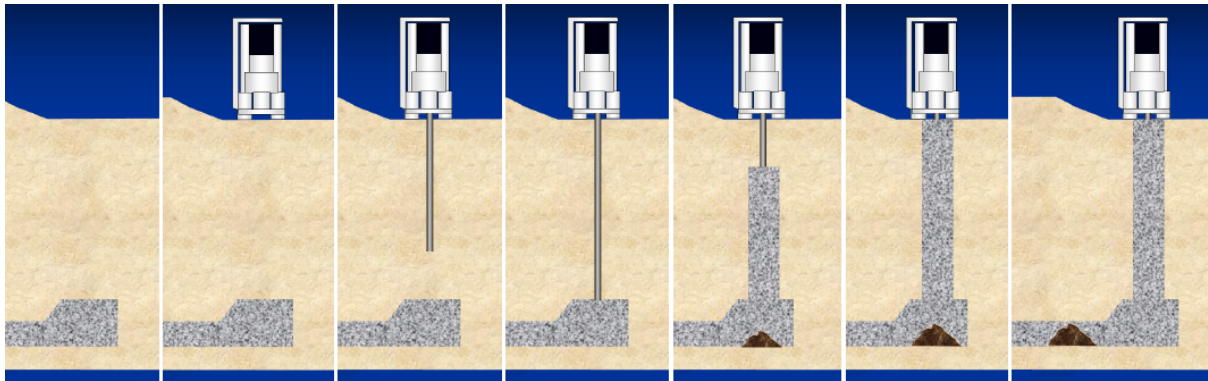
Raise boring operation - pilot hole drilling, reaming & spoil removal via adit & tunnel
